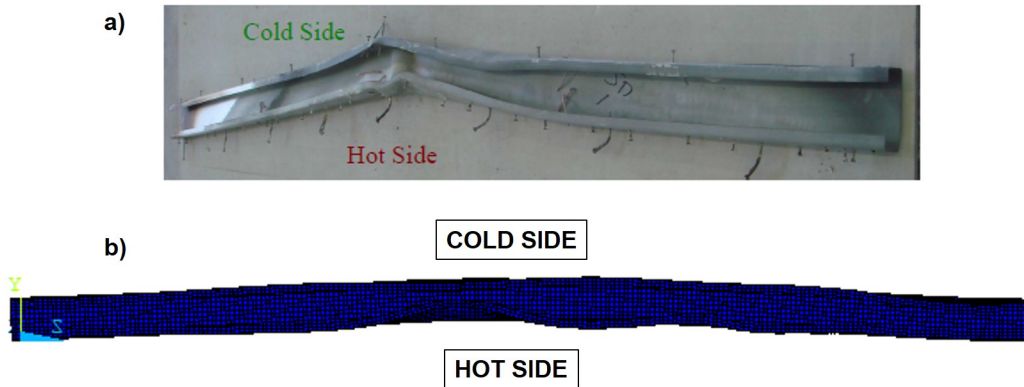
Deformed shapes at the time of failure (a): test [2] and (b): FEA.
